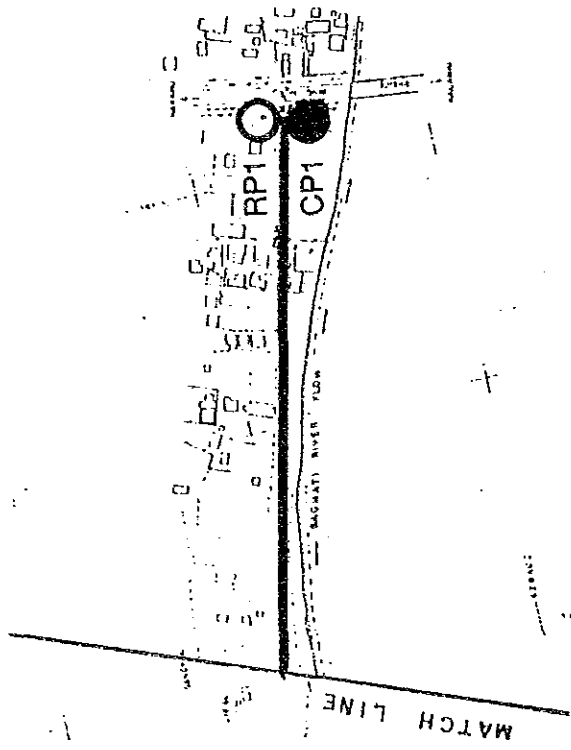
LOCATION OF ROAD PITS (1/8)
